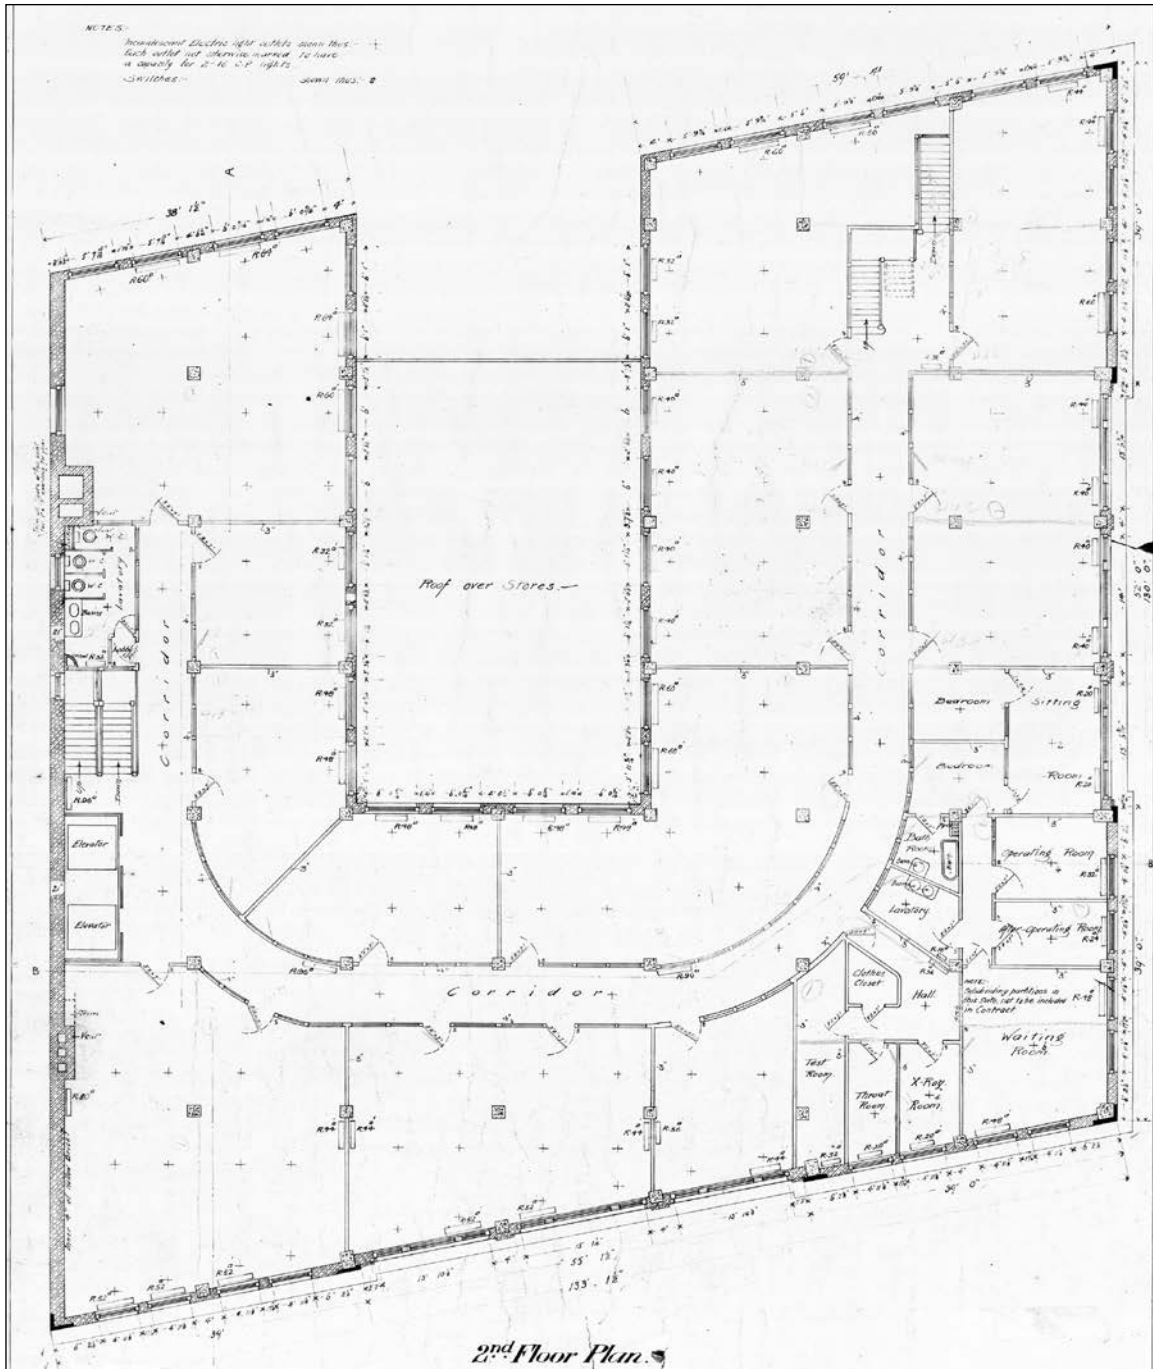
Somerset Building, Portage Avenue, Architect’s Plans, “2nd Floor Plan,” 1906.
